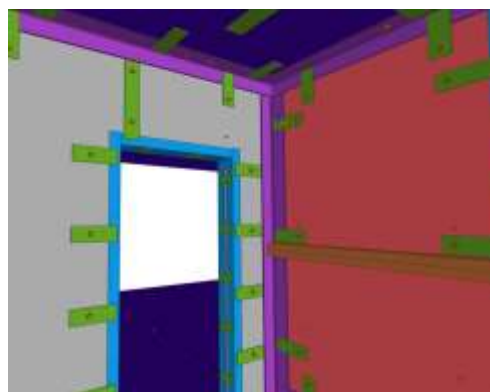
Three-dimensional model of the structural strengthening of Apartment No. 40
